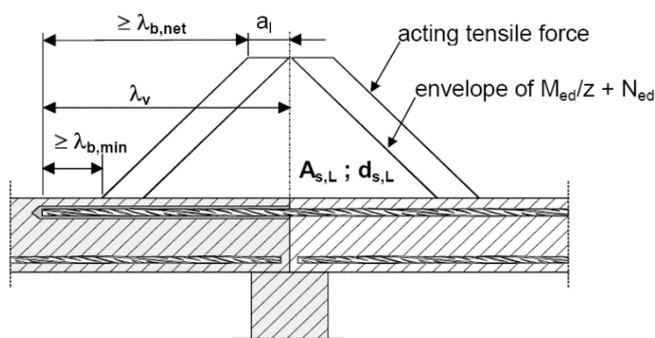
End anchoring of slabs or beams, designed as simply supported
